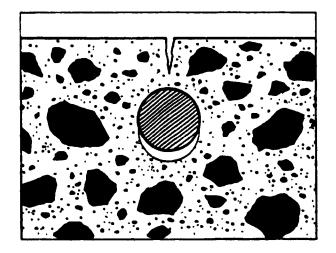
SETTLEMENT CRACKING<sup>4</sup>
